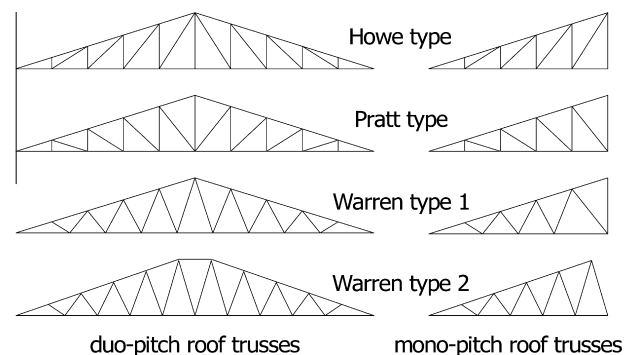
Roof trusses of the Howe, Pratt and Warren type.
